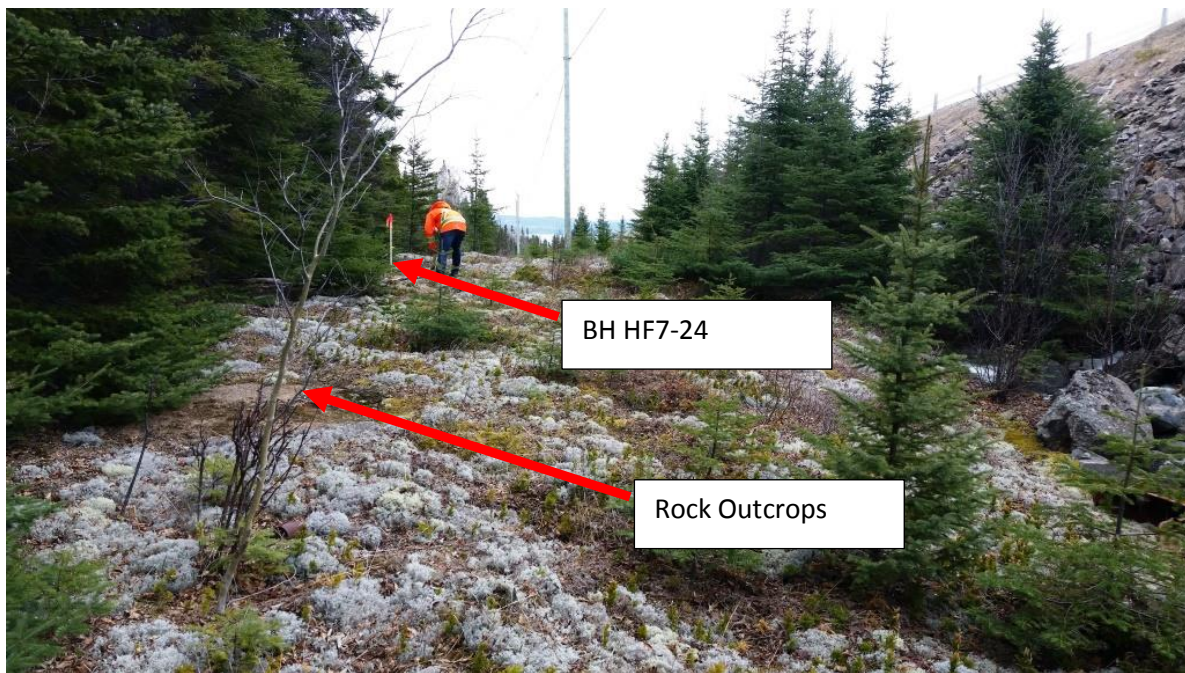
Looking toward east - Rock Outcrops and BH HF7-24 (April 2017)
